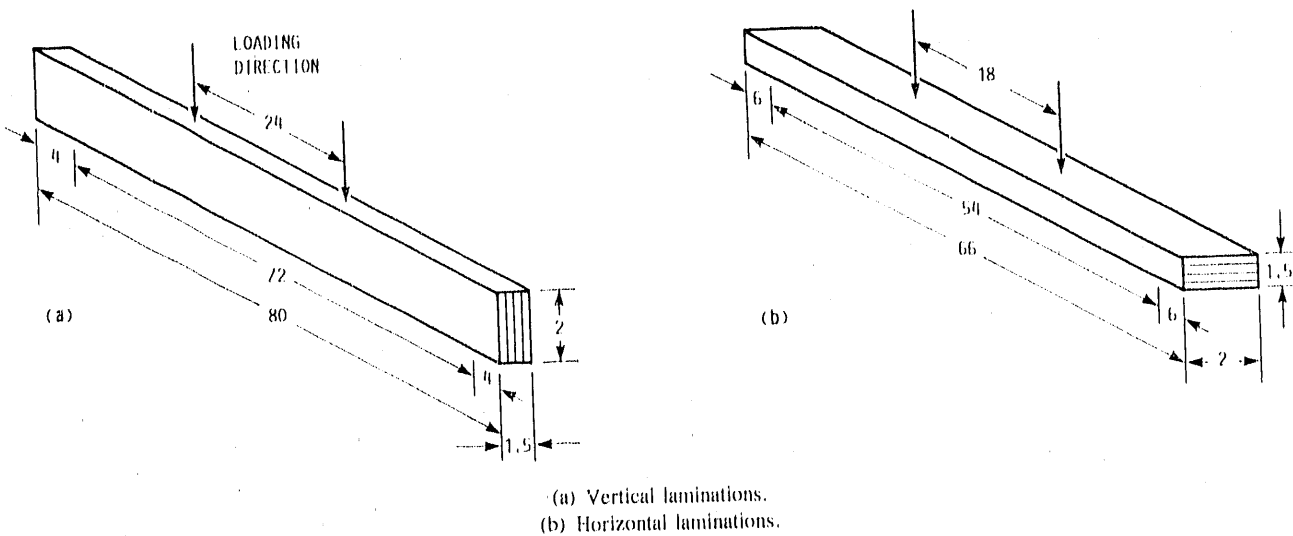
Specimens for bending with vertical and horizontal laminations. (Dimensions are in inches.)
